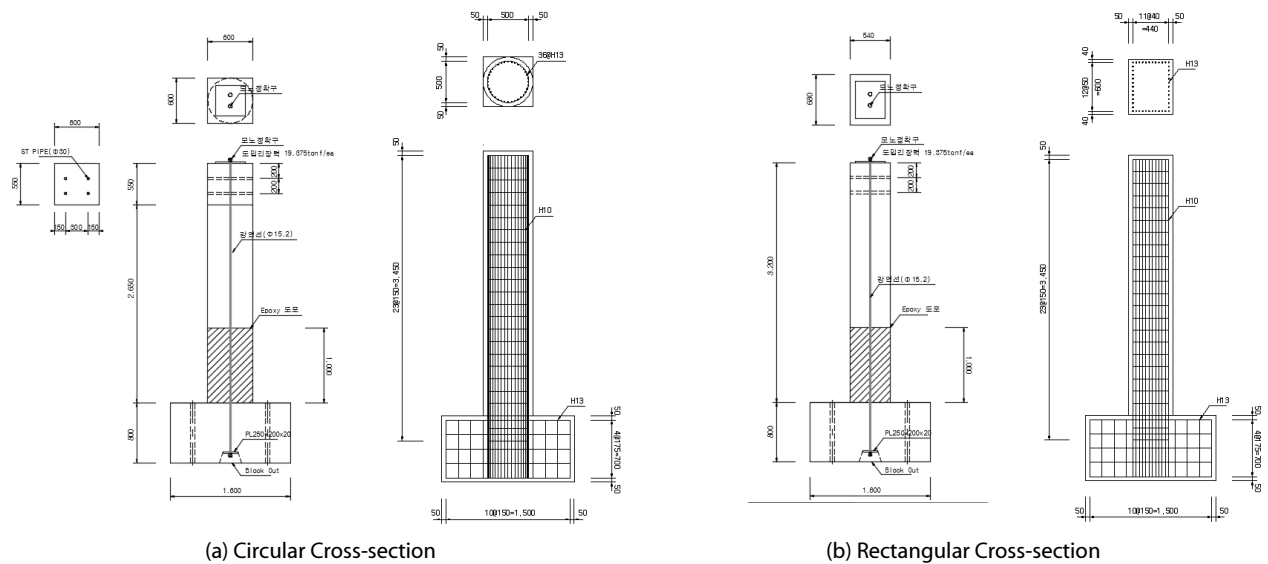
Details of Circular and Rectangular Cross-sectional Column Specimens
